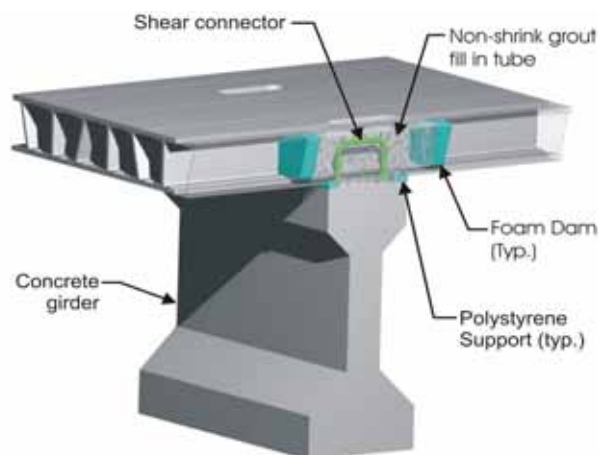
Concrete girder connection detail of Crow Creek bridge
